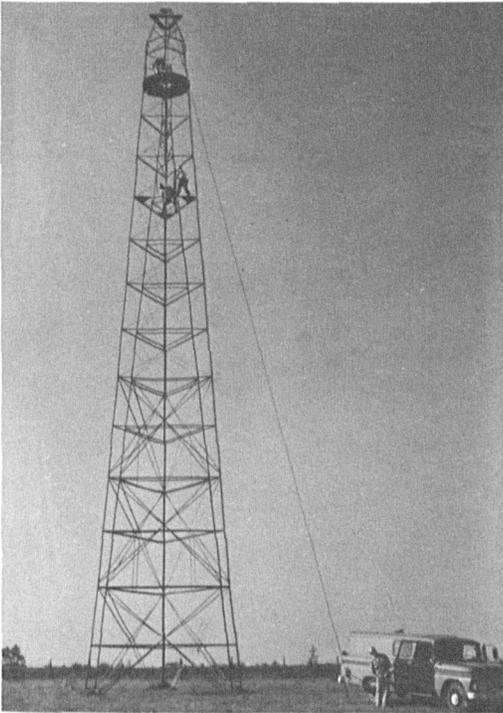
Guiding the built-up and welded sections into place.
